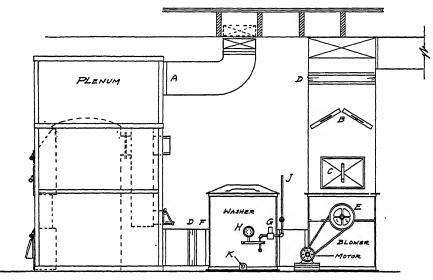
COMPLETE FAN FURNACE INSTALLATION SHOWING LOCATION OF FAN, FURNACE, FILTERS. PLENUM CHAMBER AND METHOD OF TAKE-OFF OF WARM AIR PIPE
